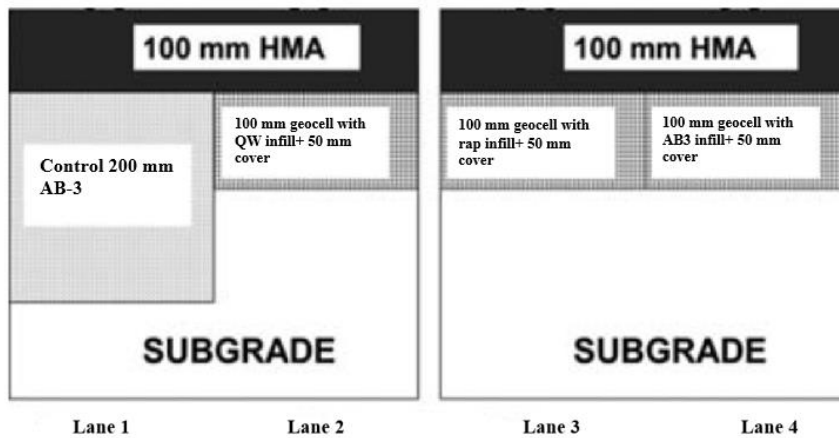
Pavement cross sections for the second test (adapted from Bortz et al., 2012).
